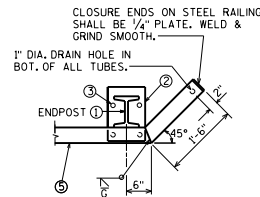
DETAIL AT END POST (THREE BEAM RAIL ATTACHMENT)
